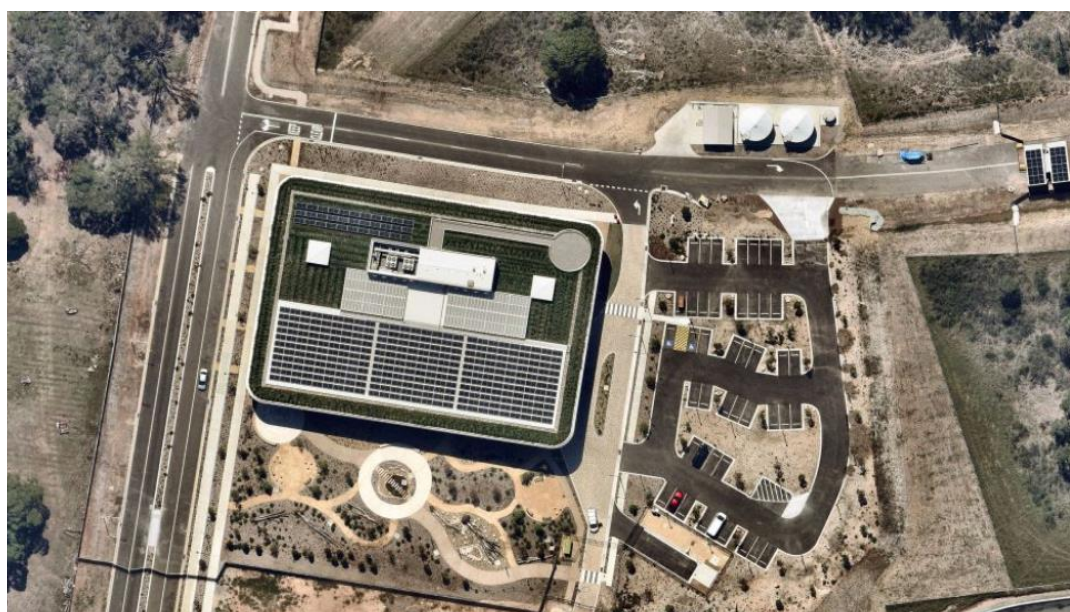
Aerial Photo of Completed AMRF Building 1 Car Park
